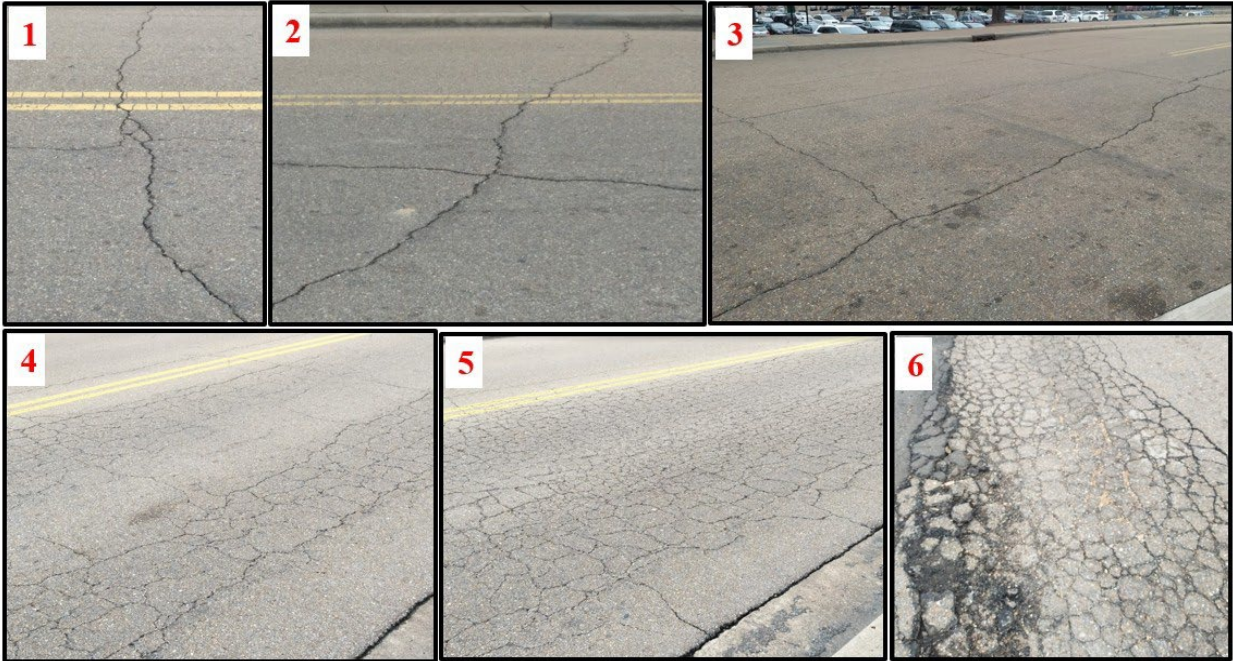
Typical crack distress types observed on asphalt surfaced road network
